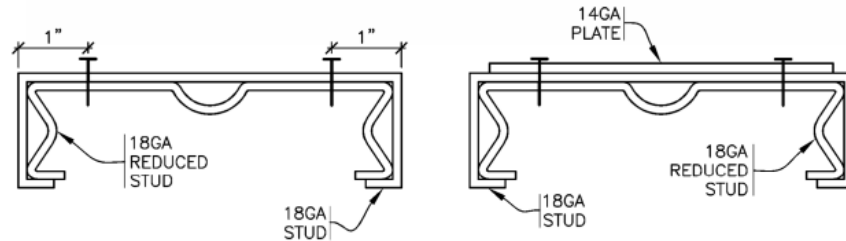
Cross-section of test specimen showing reduced stud in straight stud (left) and also with 14 GA plate (right).
